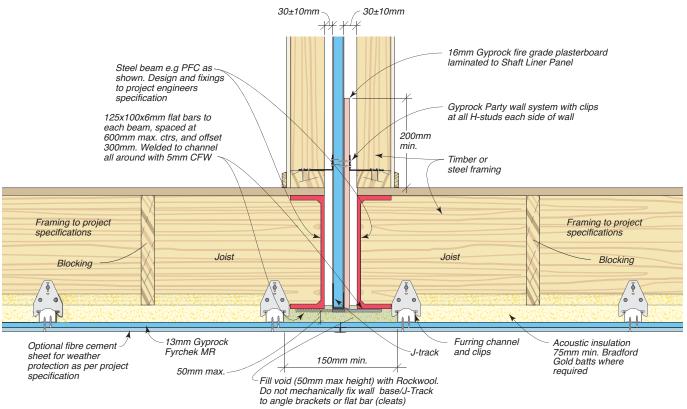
Cantilevered Stepped Soffit - With Cantilevered PFC Beams - End Elevation View
